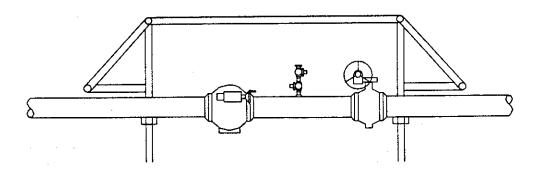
Valve Assembly and Protective Cover, 30" Gas Pipeline
